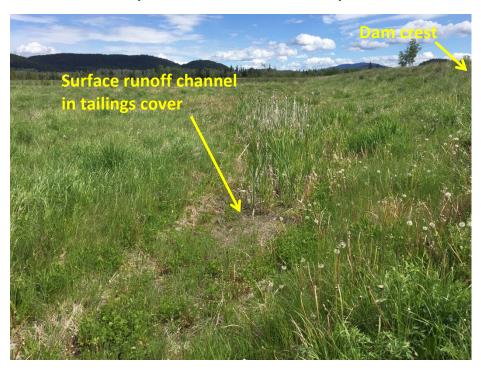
Tailings Dam – west leg, looking south along downstream slope.
